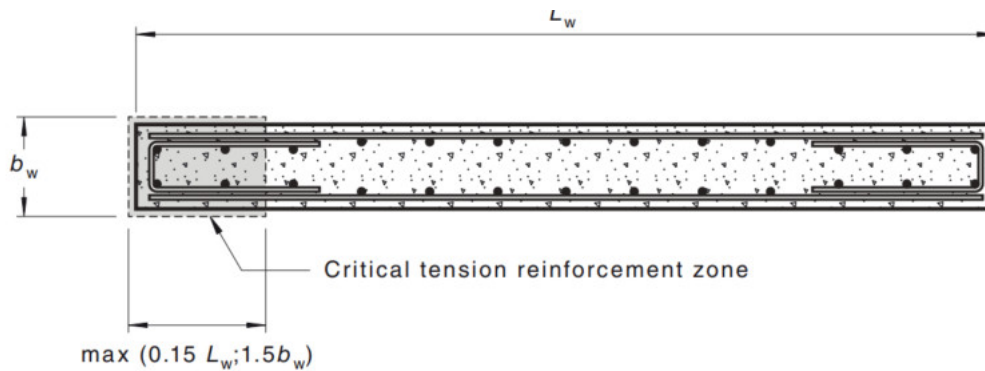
Location of the boundary region of a planar RC wall section from AS 3600:2018 (herein without additional longitudinal reinforcement)
